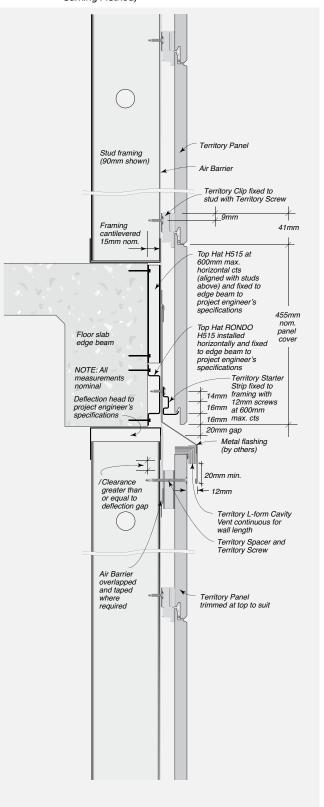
Framing and Control Joint Detail at Edge Beam – Edge Beam height less than 450mm (Continuous Wall Wrap/ Sarking Method)
